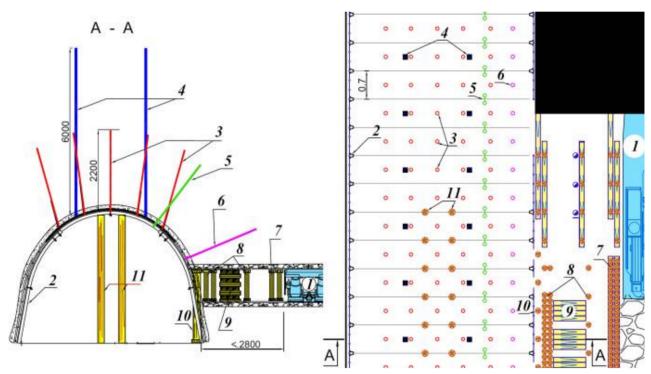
Support and reinforcement pattern of the gateroad #165 at intersection with #163 longwall: 1 -longwall set of equipment; 2 -steel arch support KShPU-17,7; 3 - rock bolts; 4 -cable bolts, length 6.0 m, paired installation, spacing 1.4 m; 5 -rock bolts connected to the top section of arch support; 6 -rock bolt for strengthening of the roof above the roadside pack; elements of roadside pack: 7 -breaker row; 8 -breaker props; 9 -chock; 10 -wooden prop between roof of the seam and floor of the gateroad; 11 -wooden props installed under each steel arch
